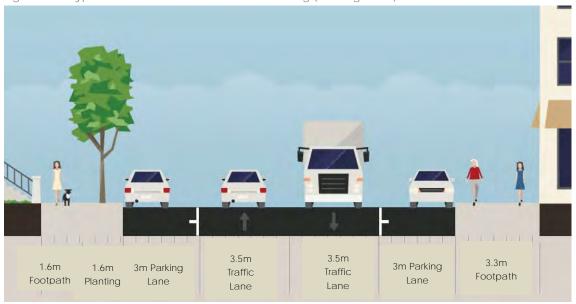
Typical Lord Street Cross Section - Existing (Looking West)
